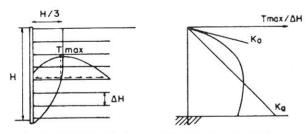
BEHAVIOUR OF A REINFORCED EARTH RETAINING WALL.
